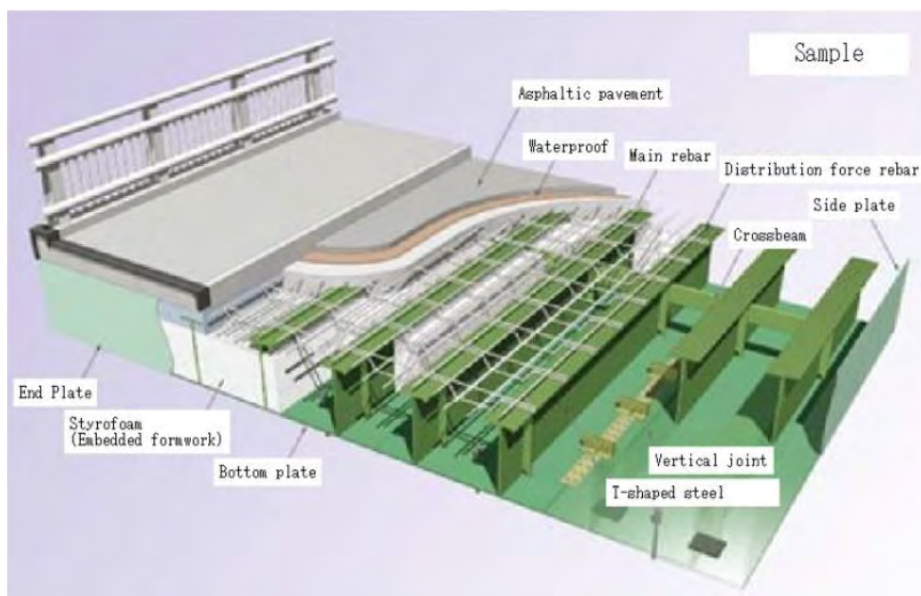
Schematic Diagram of Steel-Concrete Composite Slab Girder
